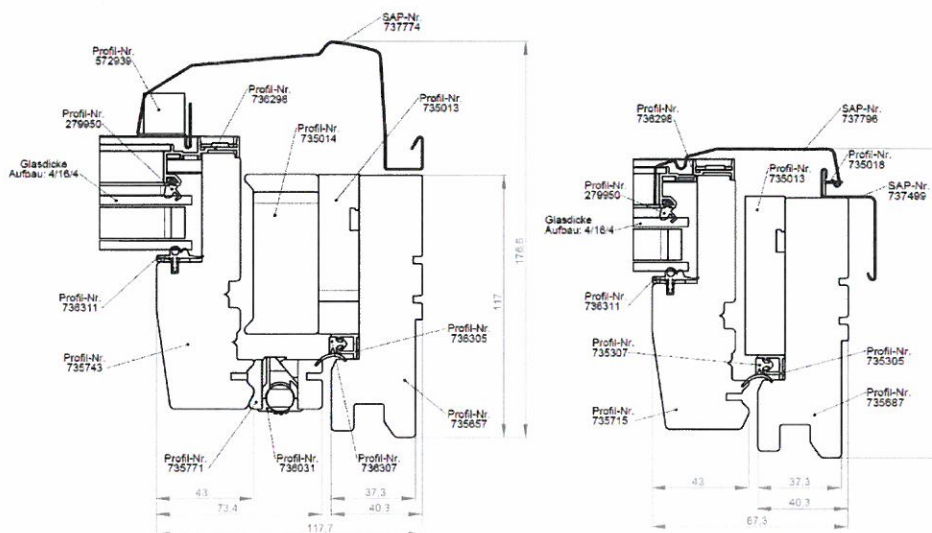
Drawing of wooden roof window, type Q-4...S / QT4...S with ventilation flap
